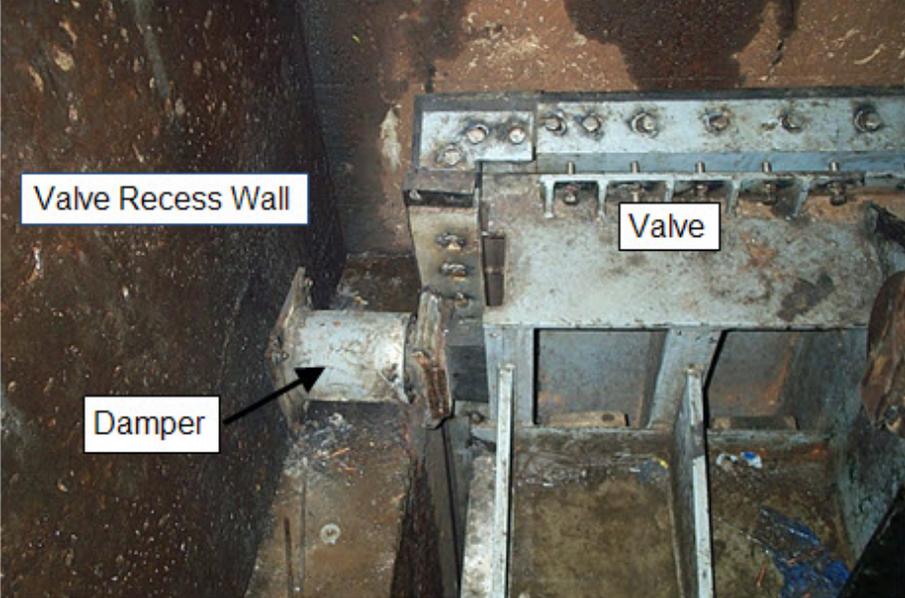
Damper attached to valve recess wall, Chickamauga Lock (top view looking downstream).
